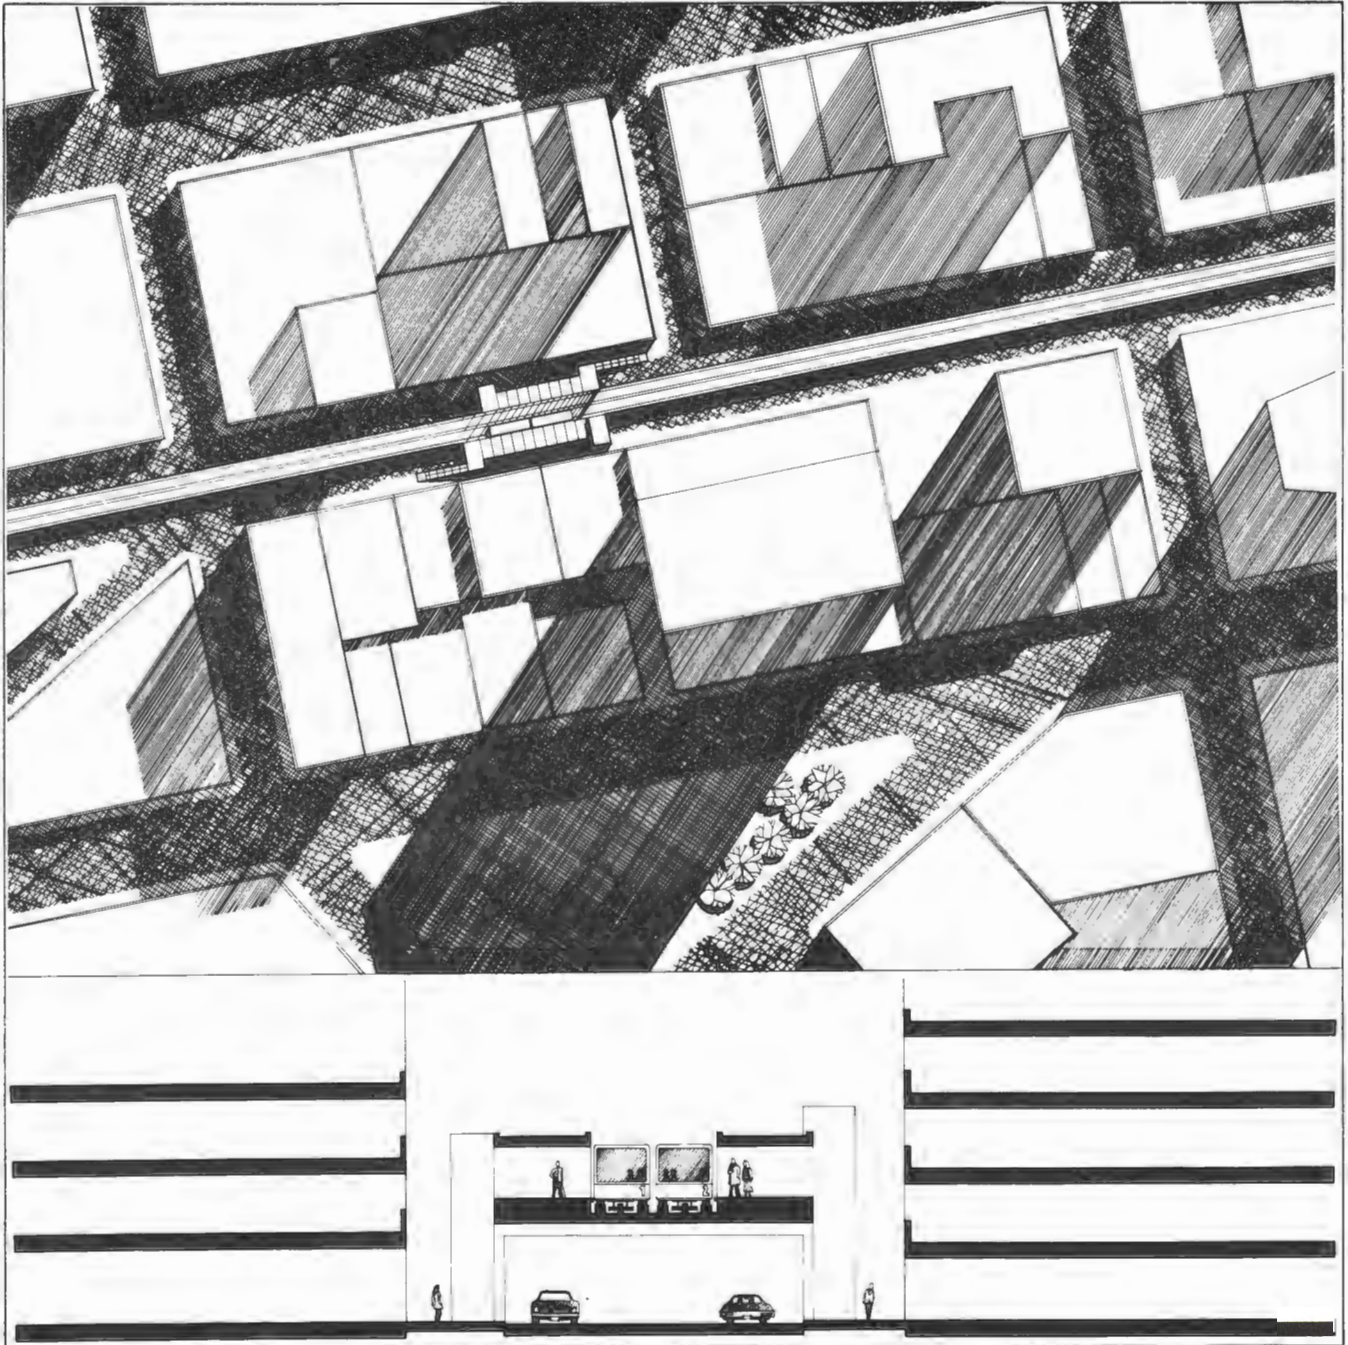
Site Plan and Section of AGT Station on Elm Street
